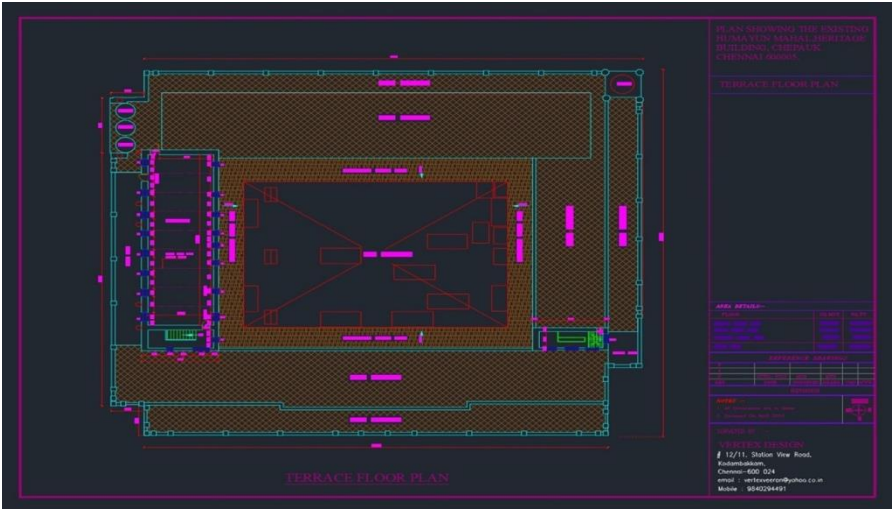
f. Shows the Plan layout of the Humayun Palace in the format of a CAD drawing.
